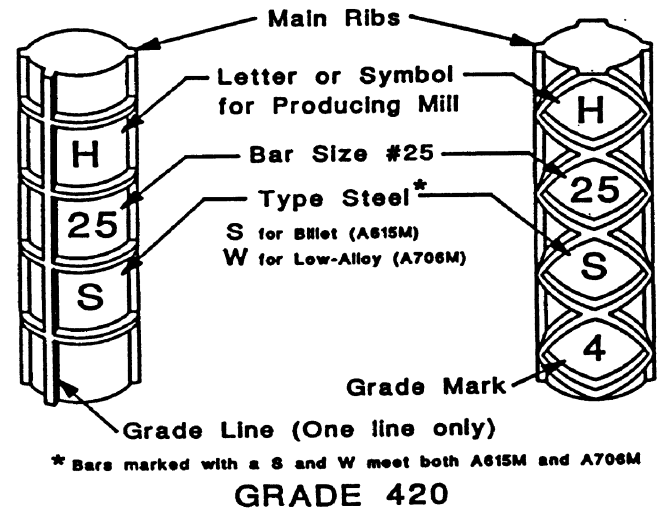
Typical metric reinforcing bar identification markings (courtesy of Concrete Reinforcing Steel Institute).
